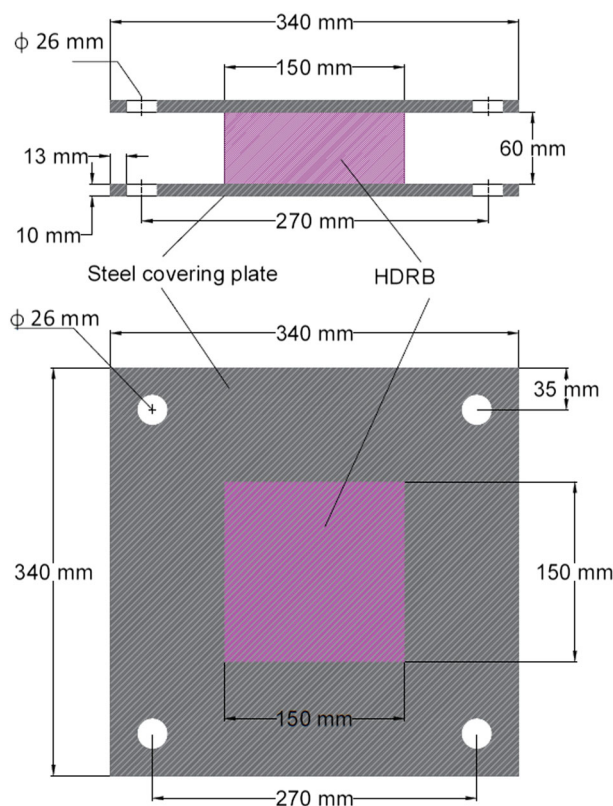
Side view and top view of rubber bearing for half-cyclic compression test
